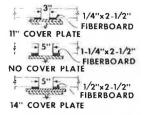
Shear connector details for continuous steel girder utilizing prestressed subdeck panels.
